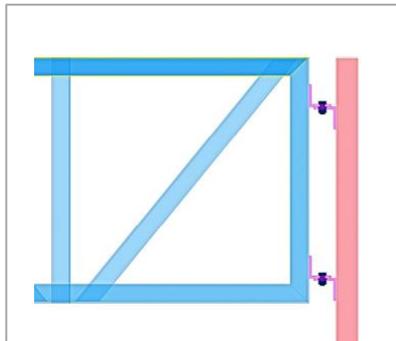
Typical standard SHS/RHS post connection to truss PFC/SHS/RHS end vertical
